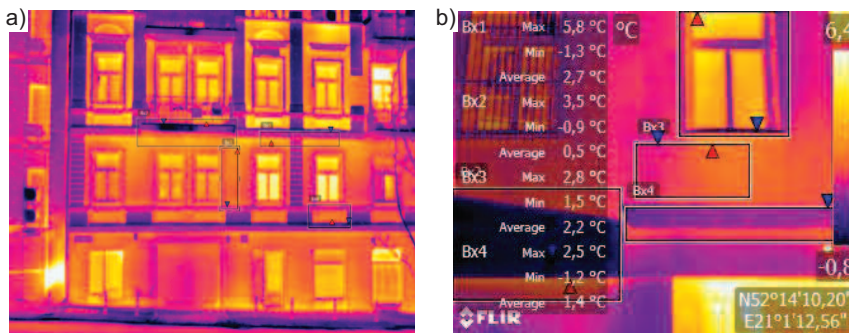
Thermal images of: a) the front elevation of the building; b) the back elevation of the building
